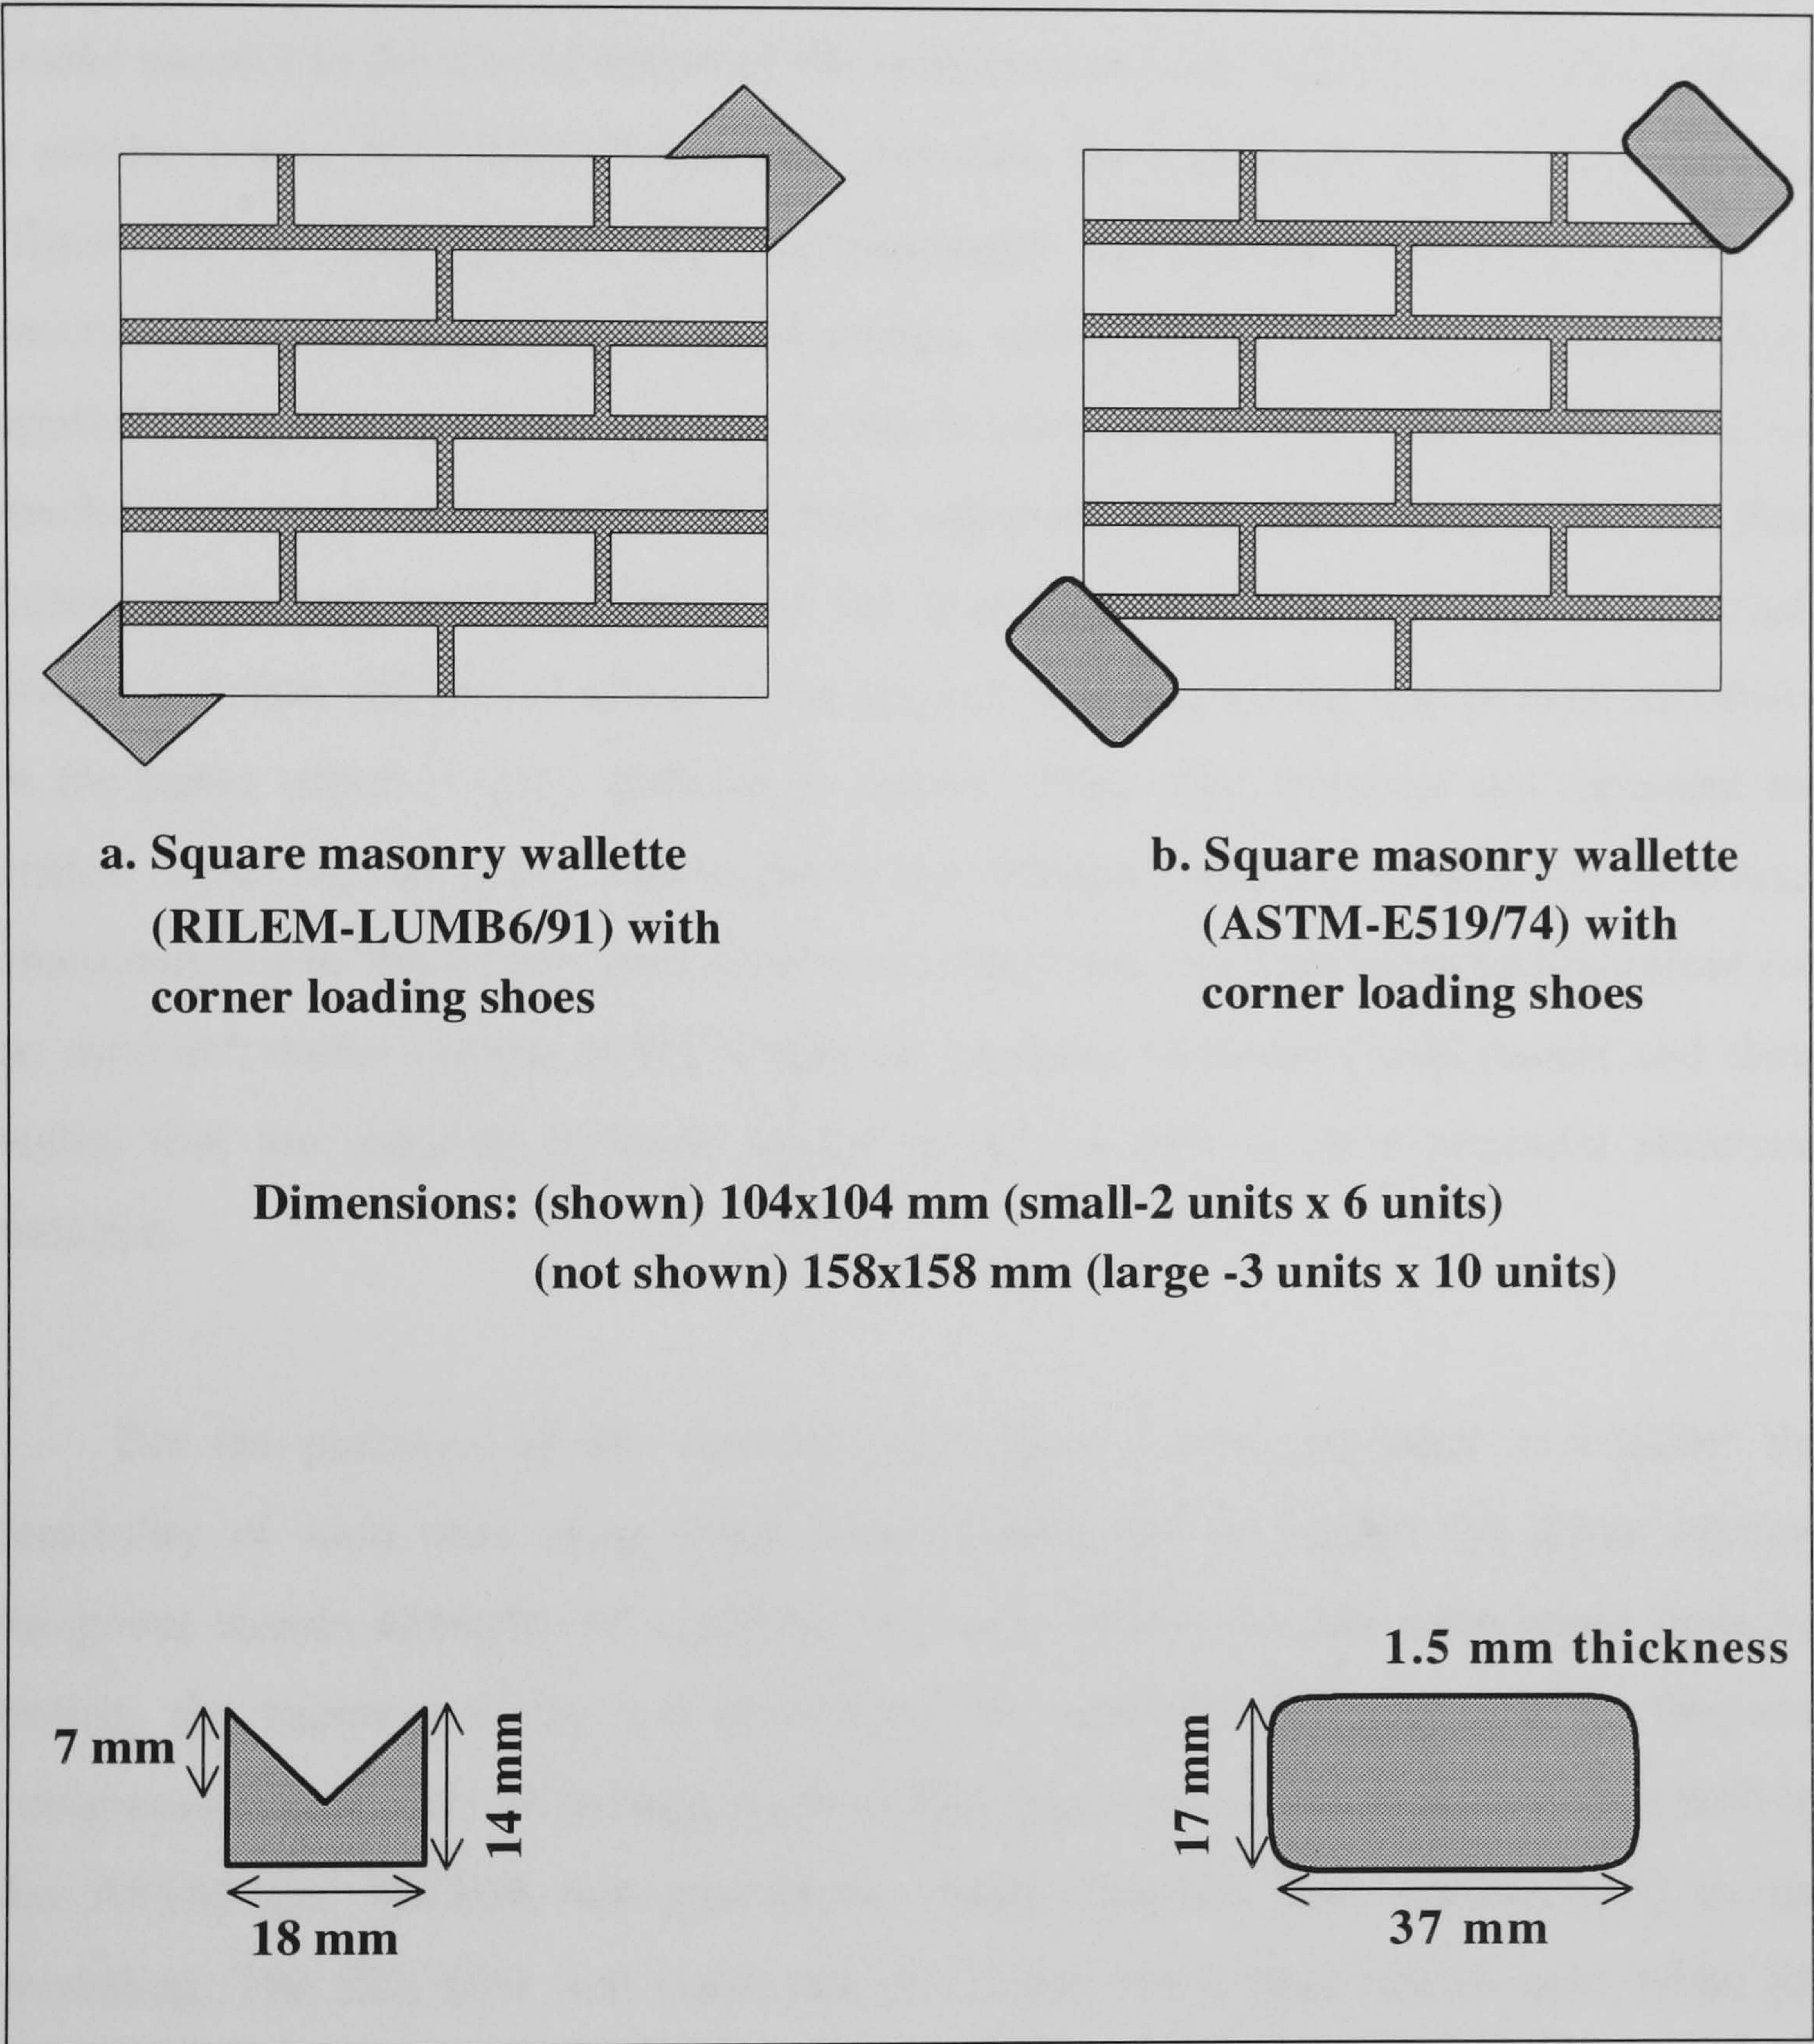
Masonry assemblages for in-plane tensile splitting tests
